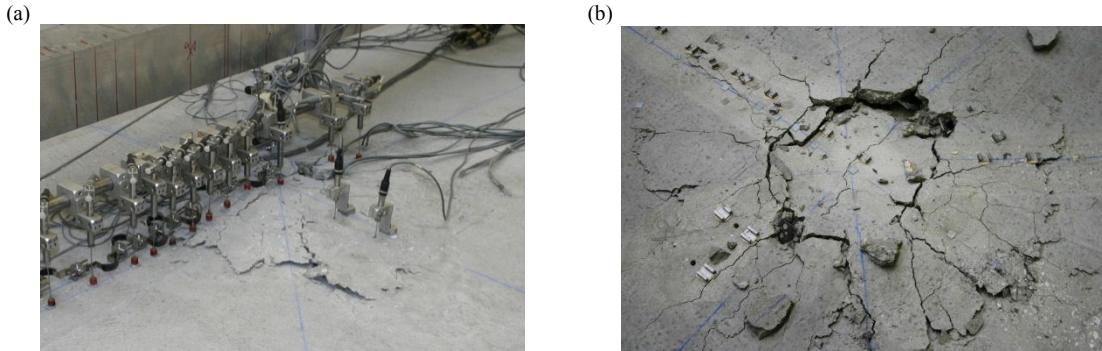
Top view after failure of (a) specimen PL6 and (b) specimen PL7
